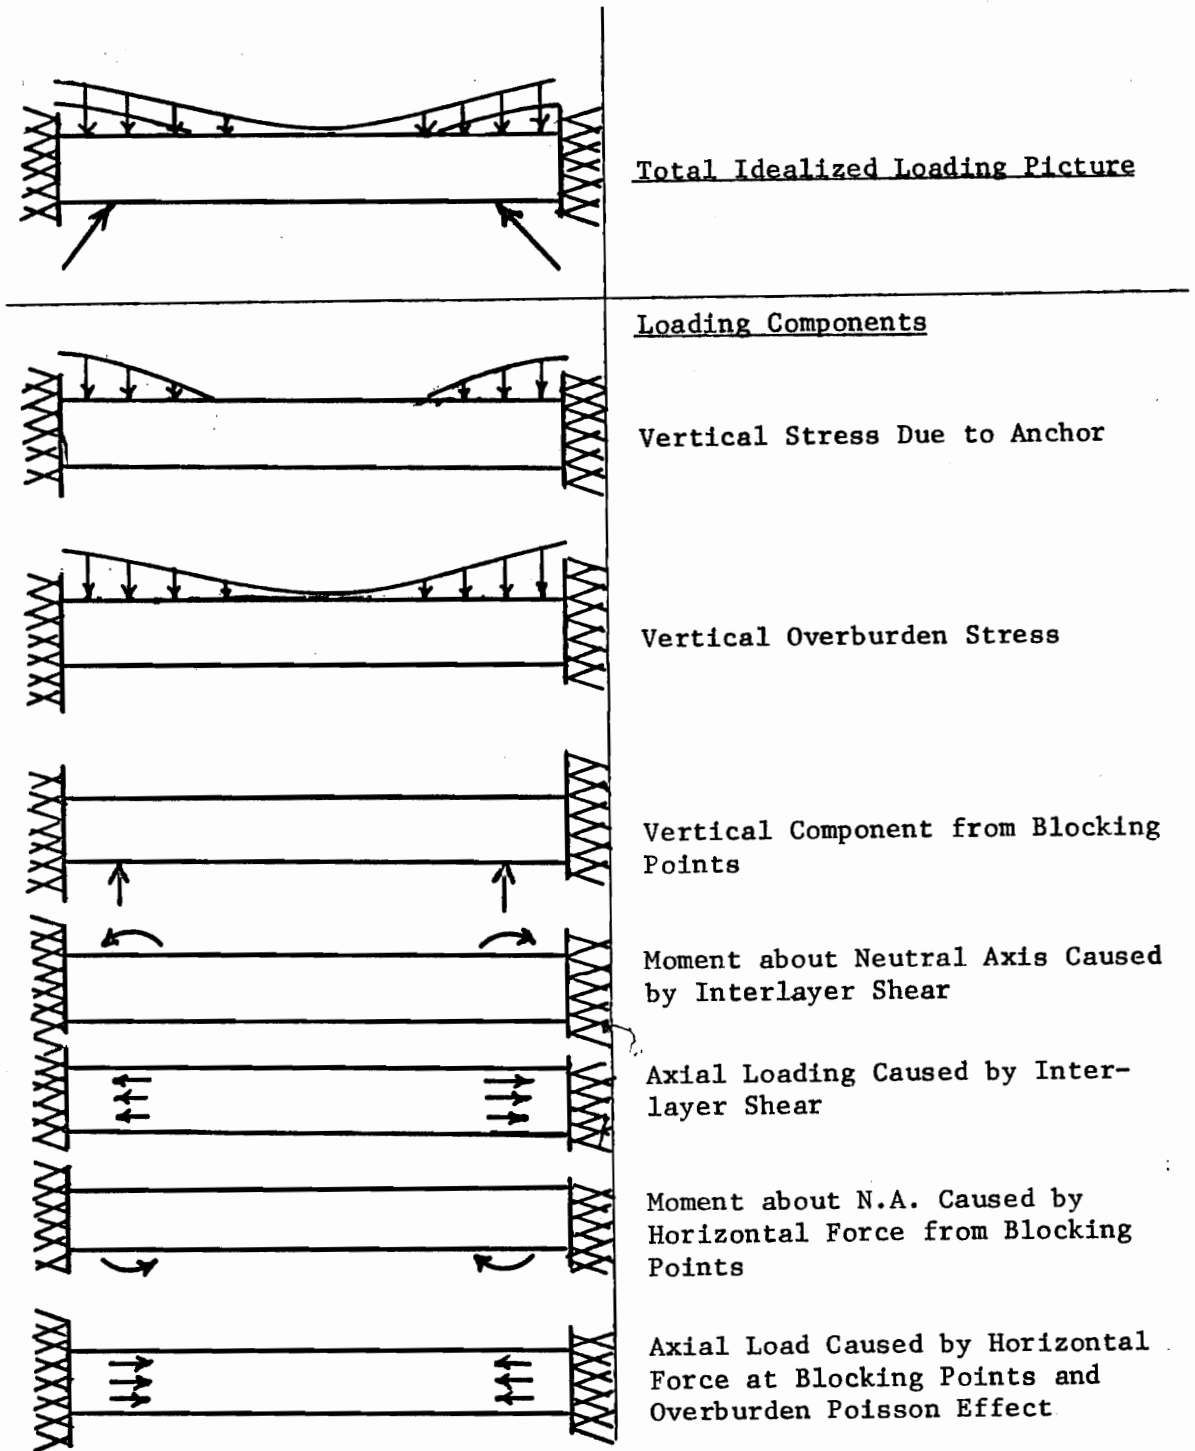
Separation of Loads in Idealized Truss Supported Roof.
